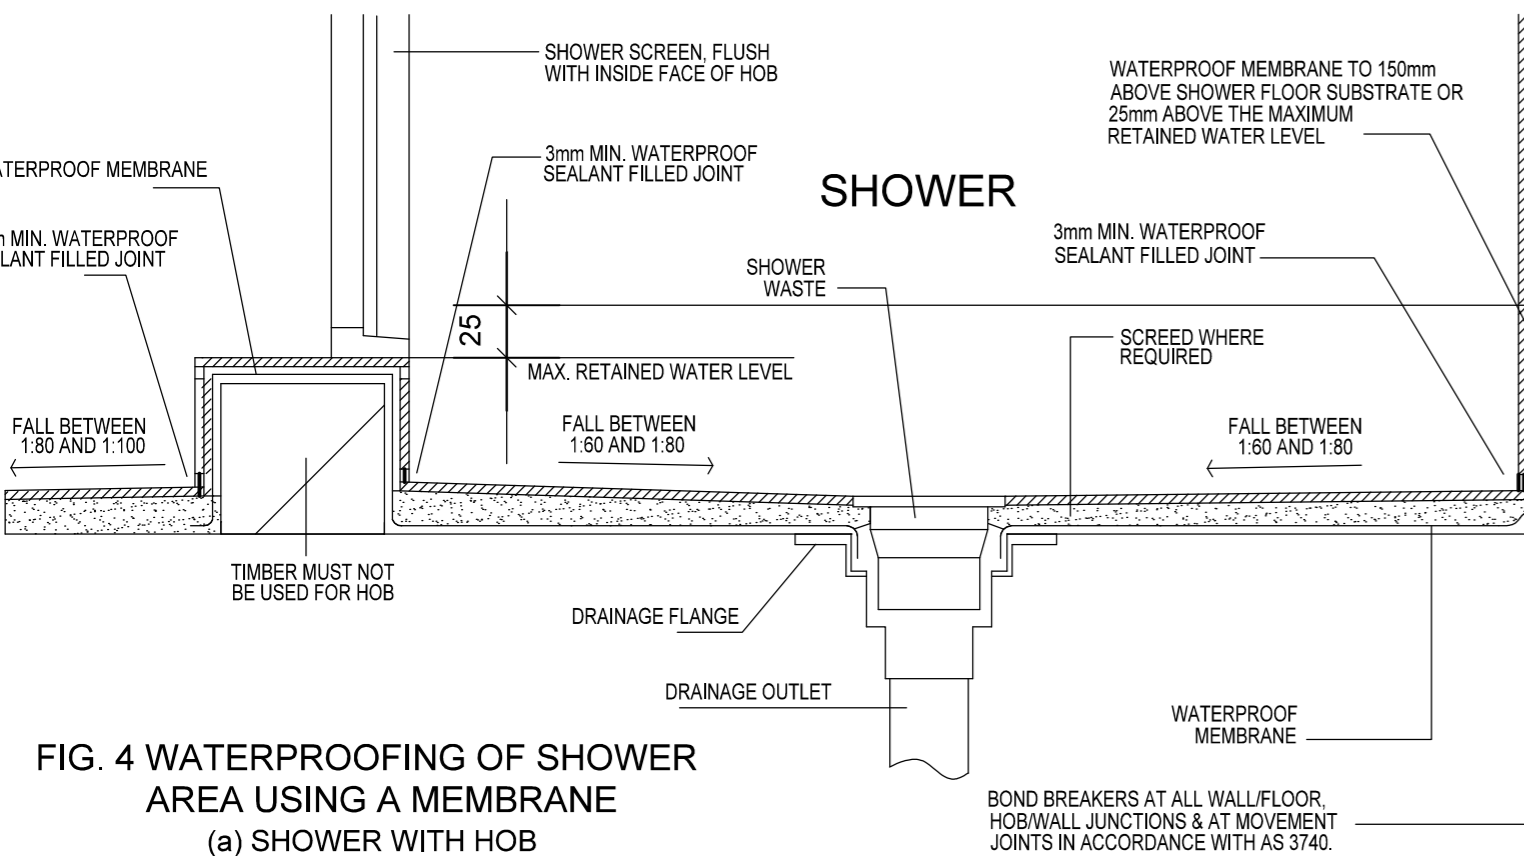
WATERPROOFING OF SHOWER AREA USING A MEMBRANE
